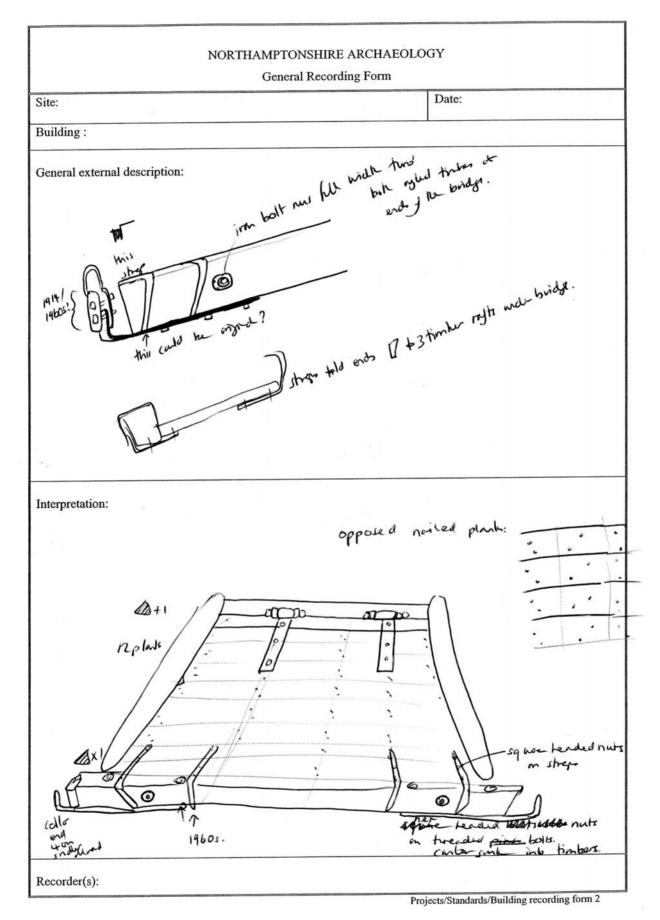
Working sketch of detail of bank structure below the raised footbridge, looking west
